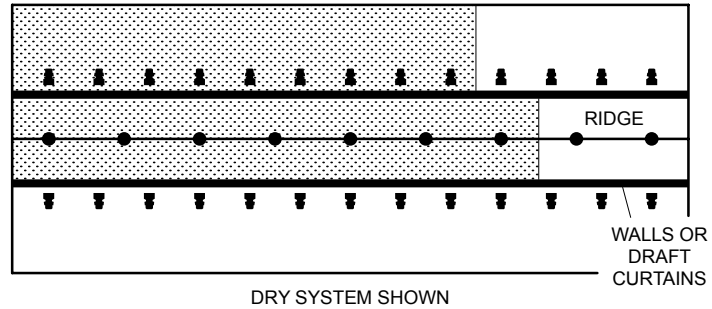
C-2. BB Sprinklers & Standard Spray Sprinklers Beyond An Obstruction
